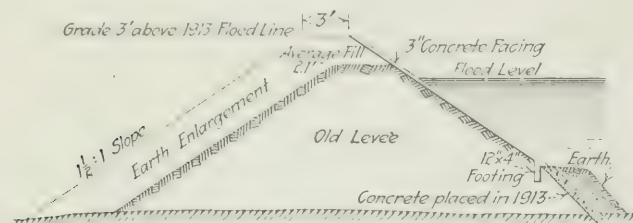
WABASH RIVER LEVEE, SHOWING EARTH ENLARGEMENT AND CONCRETE FACING
